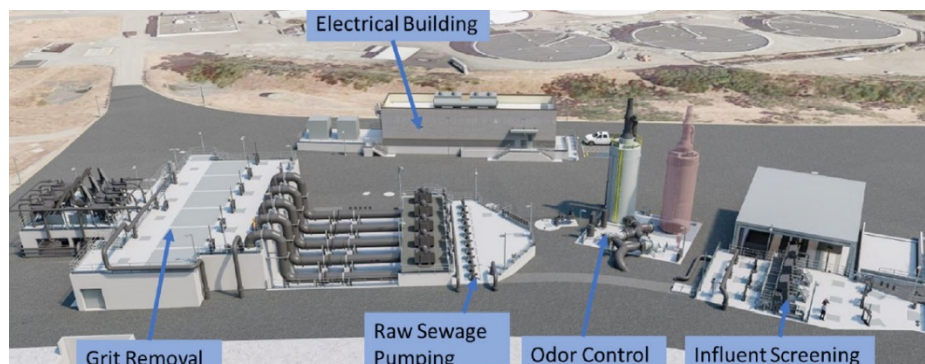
COMPUTER RENDERING OF NEW HEADWORKS SITE LAYOUT
